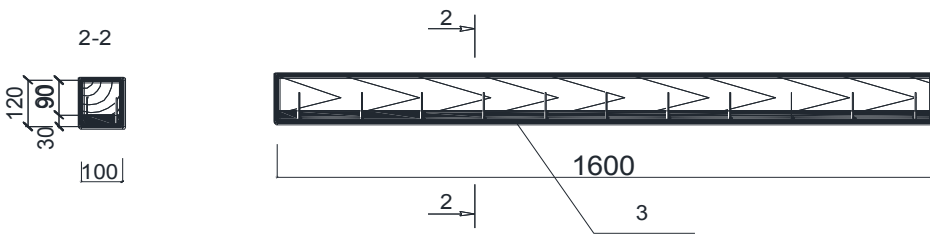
A wood-rubcon reinforced composite bridge beam. Where: 3-rubcon.
